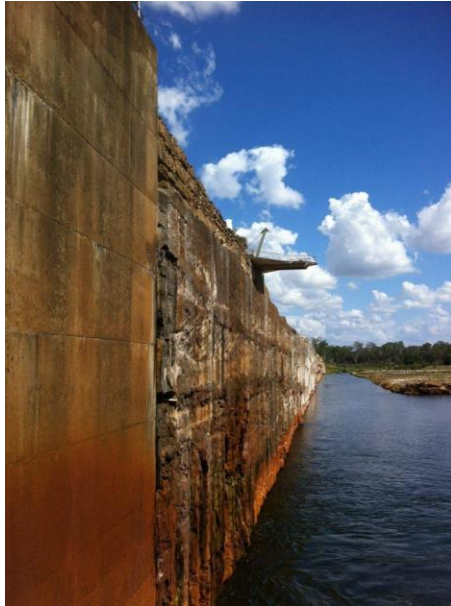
; Photo 9 - Dam wall fixed flush to sandstone
